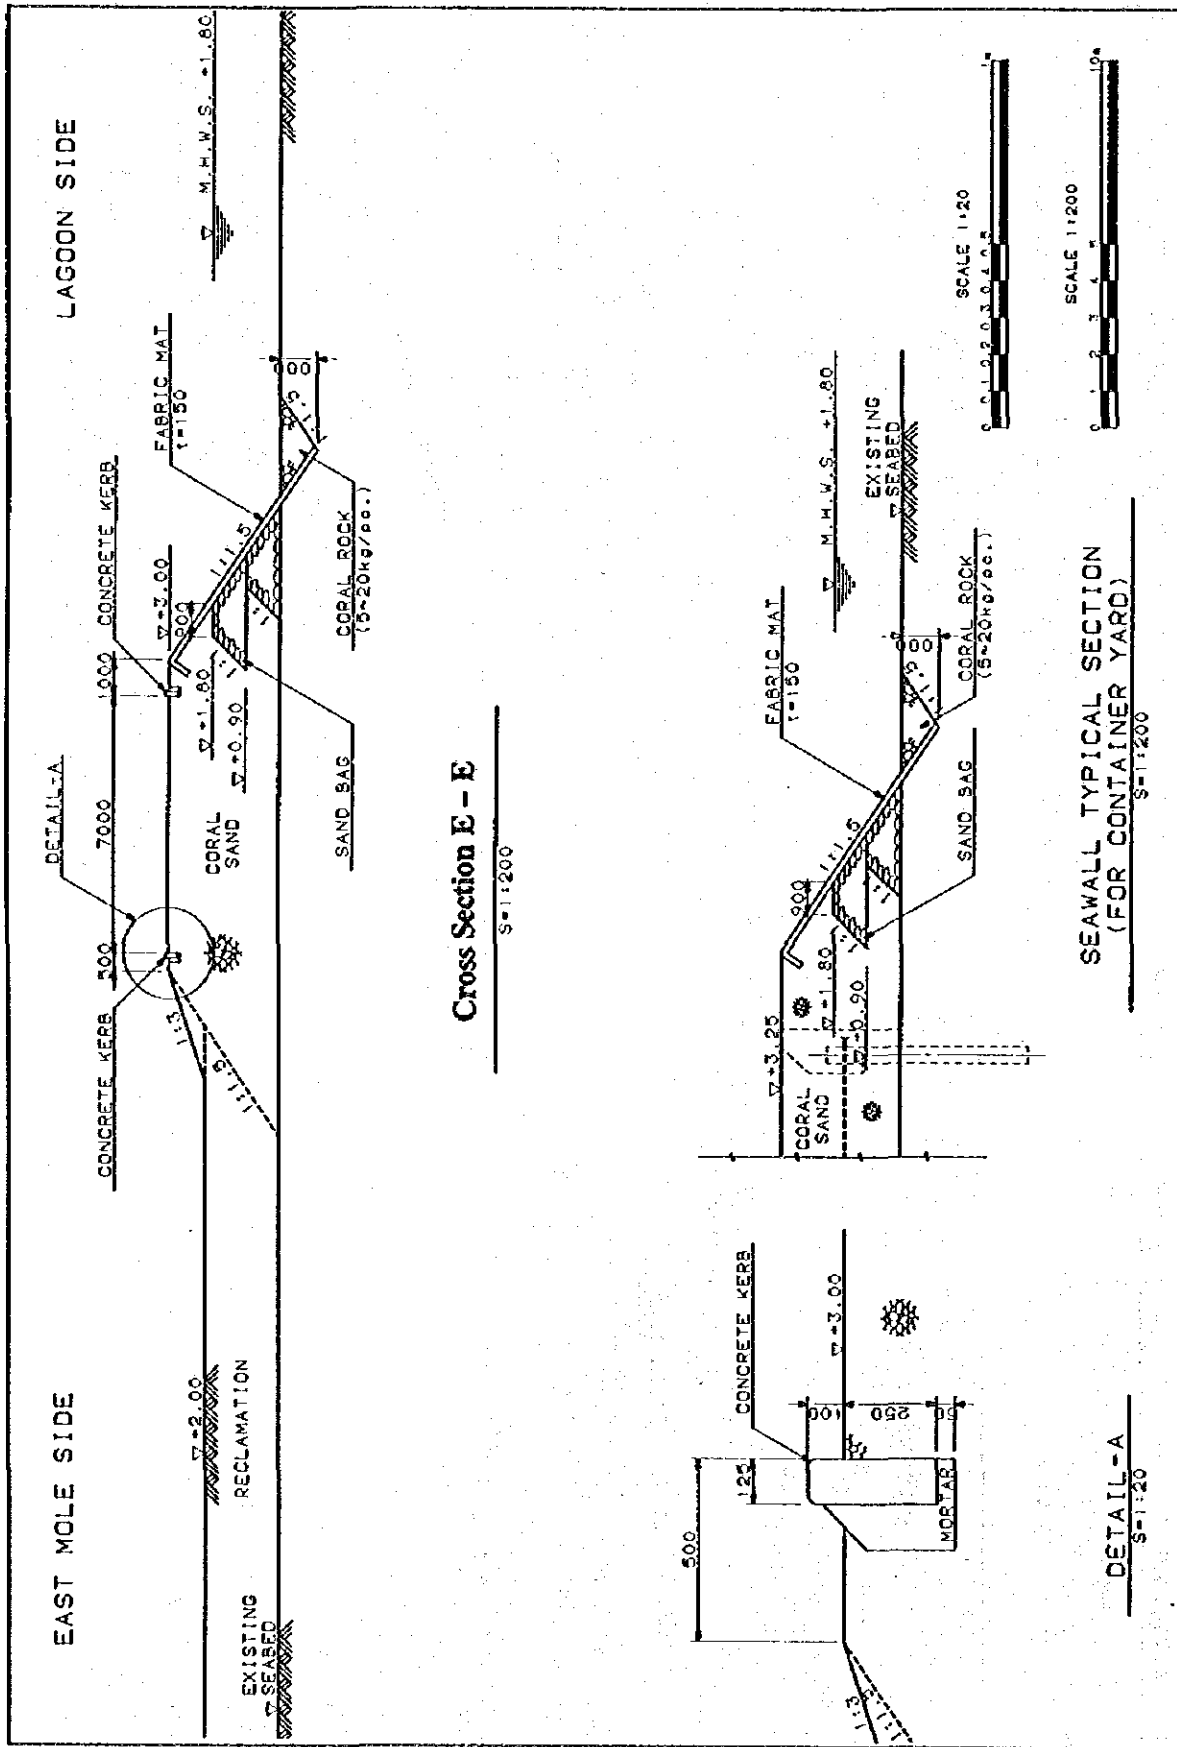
Typical Cross Section of Revetment along the Access Road
